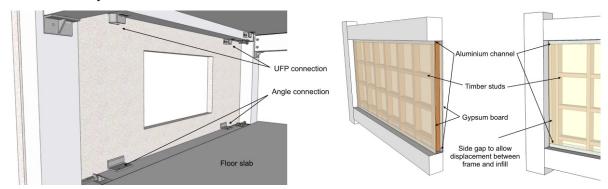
a) View from inside of building of facade connections (left). b) Low-damage infill design (right)
